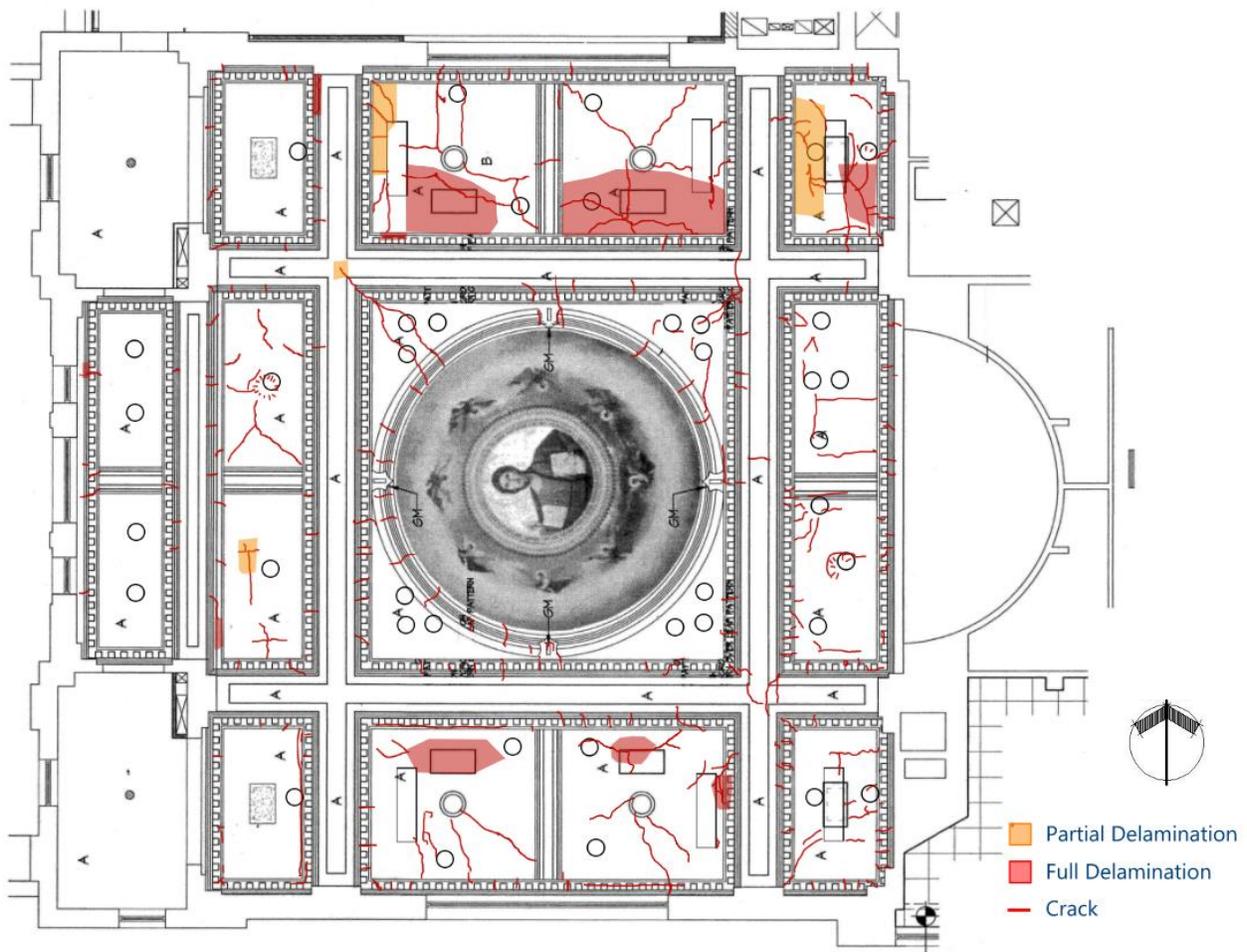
Reflected sanctuary ceiling plan showing locations of cracks and delaminated plaster. (Drawing excerpt provided by St. Nicholas Greek Orthodox Cathedral).
